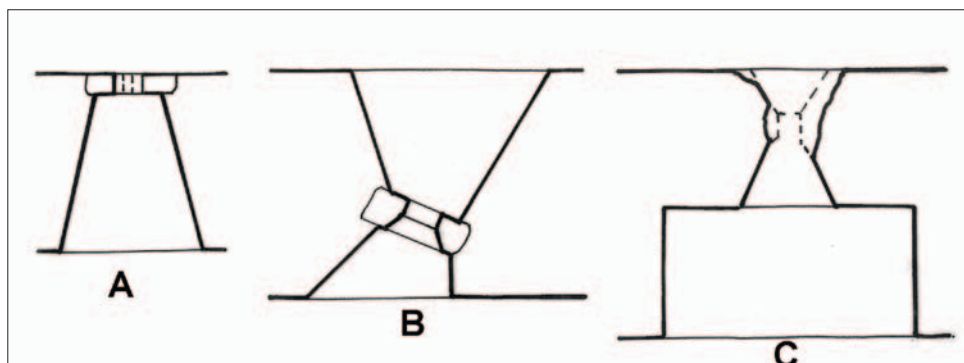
Different variants of gun loops according to the thickness of the walls: A – Furjan, the defense tower; B – Susedgrad, western outer walls; C – Stupčanica, walls underneath the defense tower (drawing by: Z. Horvat)
